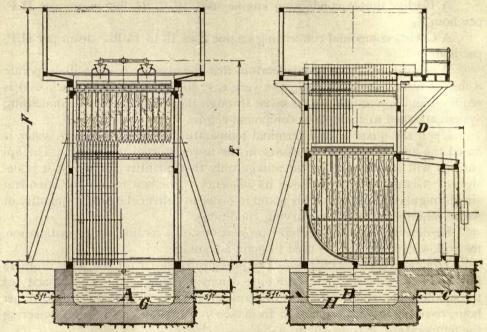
Views of Cooling Tower Giving General Dimensions (See Tables.)
